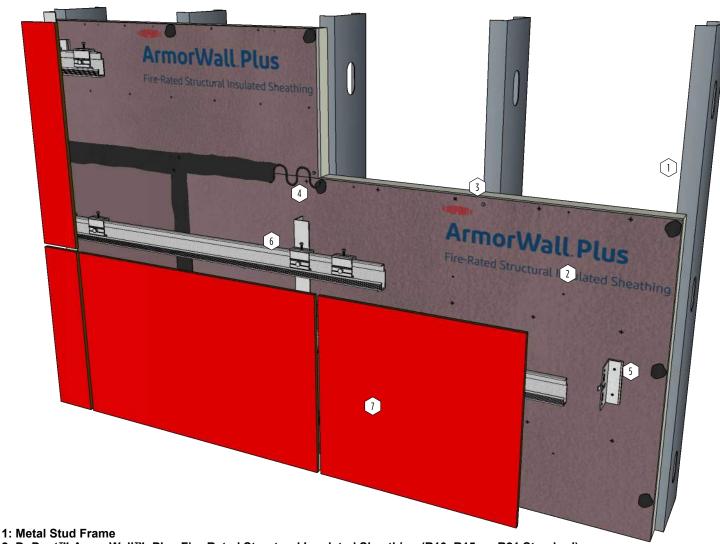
DETAIL TITLE: ADHERED CF PANEL CLADDING ON DUPONT™ ARMORWALL™ PLUS TO MEDTAL STUD FIELD OF WAL
